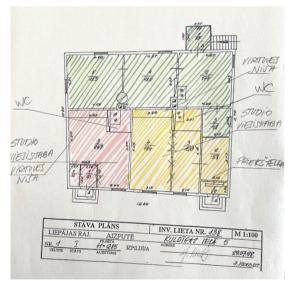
Zoning of the renovated building layout. Scheme made by the author.
